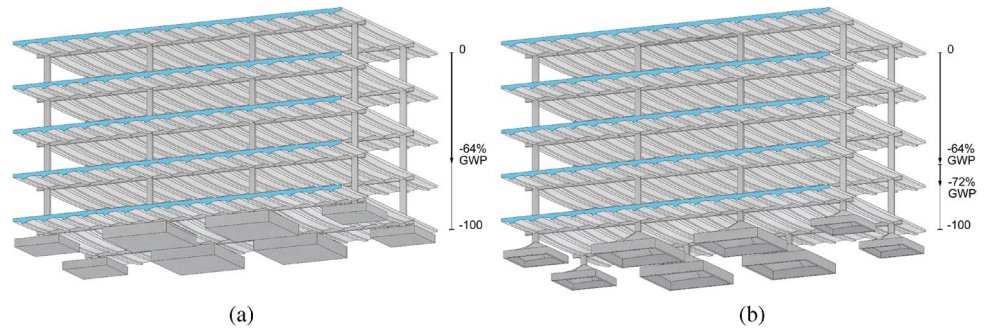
The savings in global warming potential of the structural frame when (a) floor slabs are optimized (64%), and (b) floor slabs are optimized and shell foundations are used (72%) for the conditions outlined in Sect. 3.2
